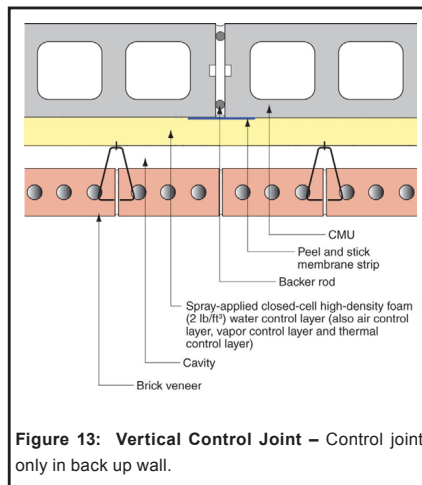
Vertical Control Joint – Control joint only in back up wall.
